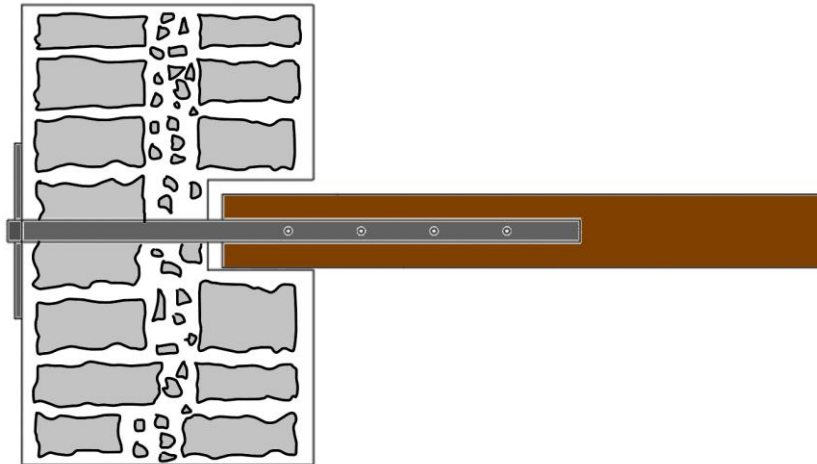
Reinforced timber floors using steel ties and rods to enhance the connection with the load-bearing walls.
